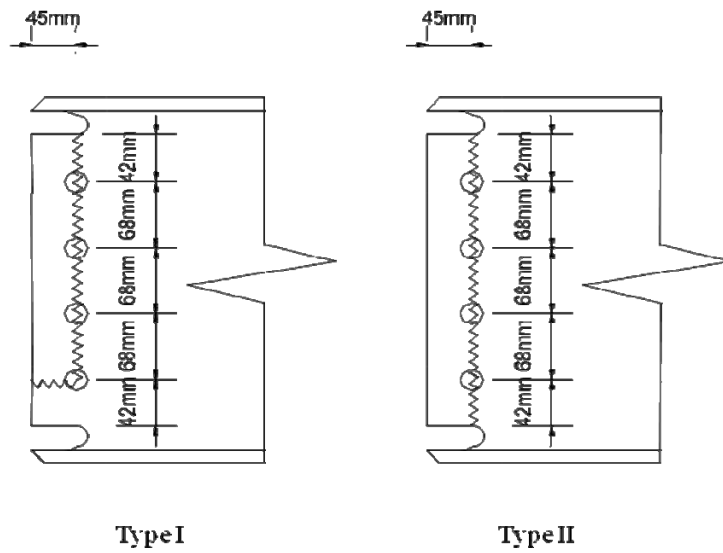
Beam Web Shear Fracture Surfaces
